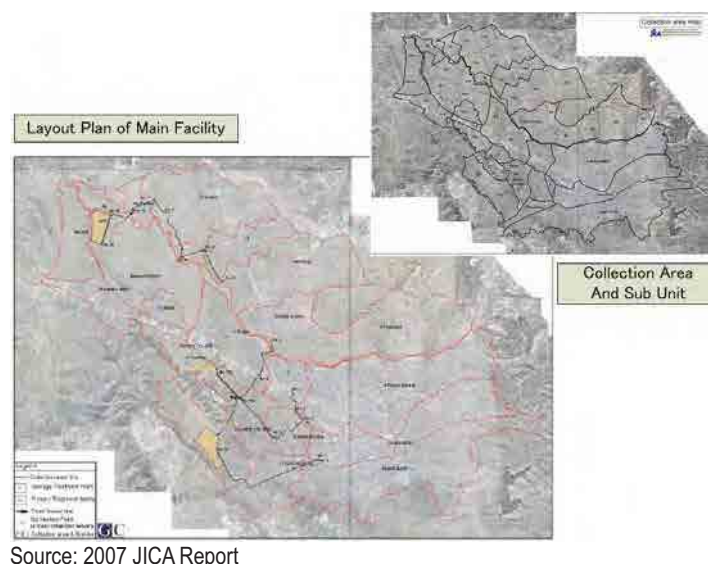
Main Facility Layout Plan in 2007 JICA Report
